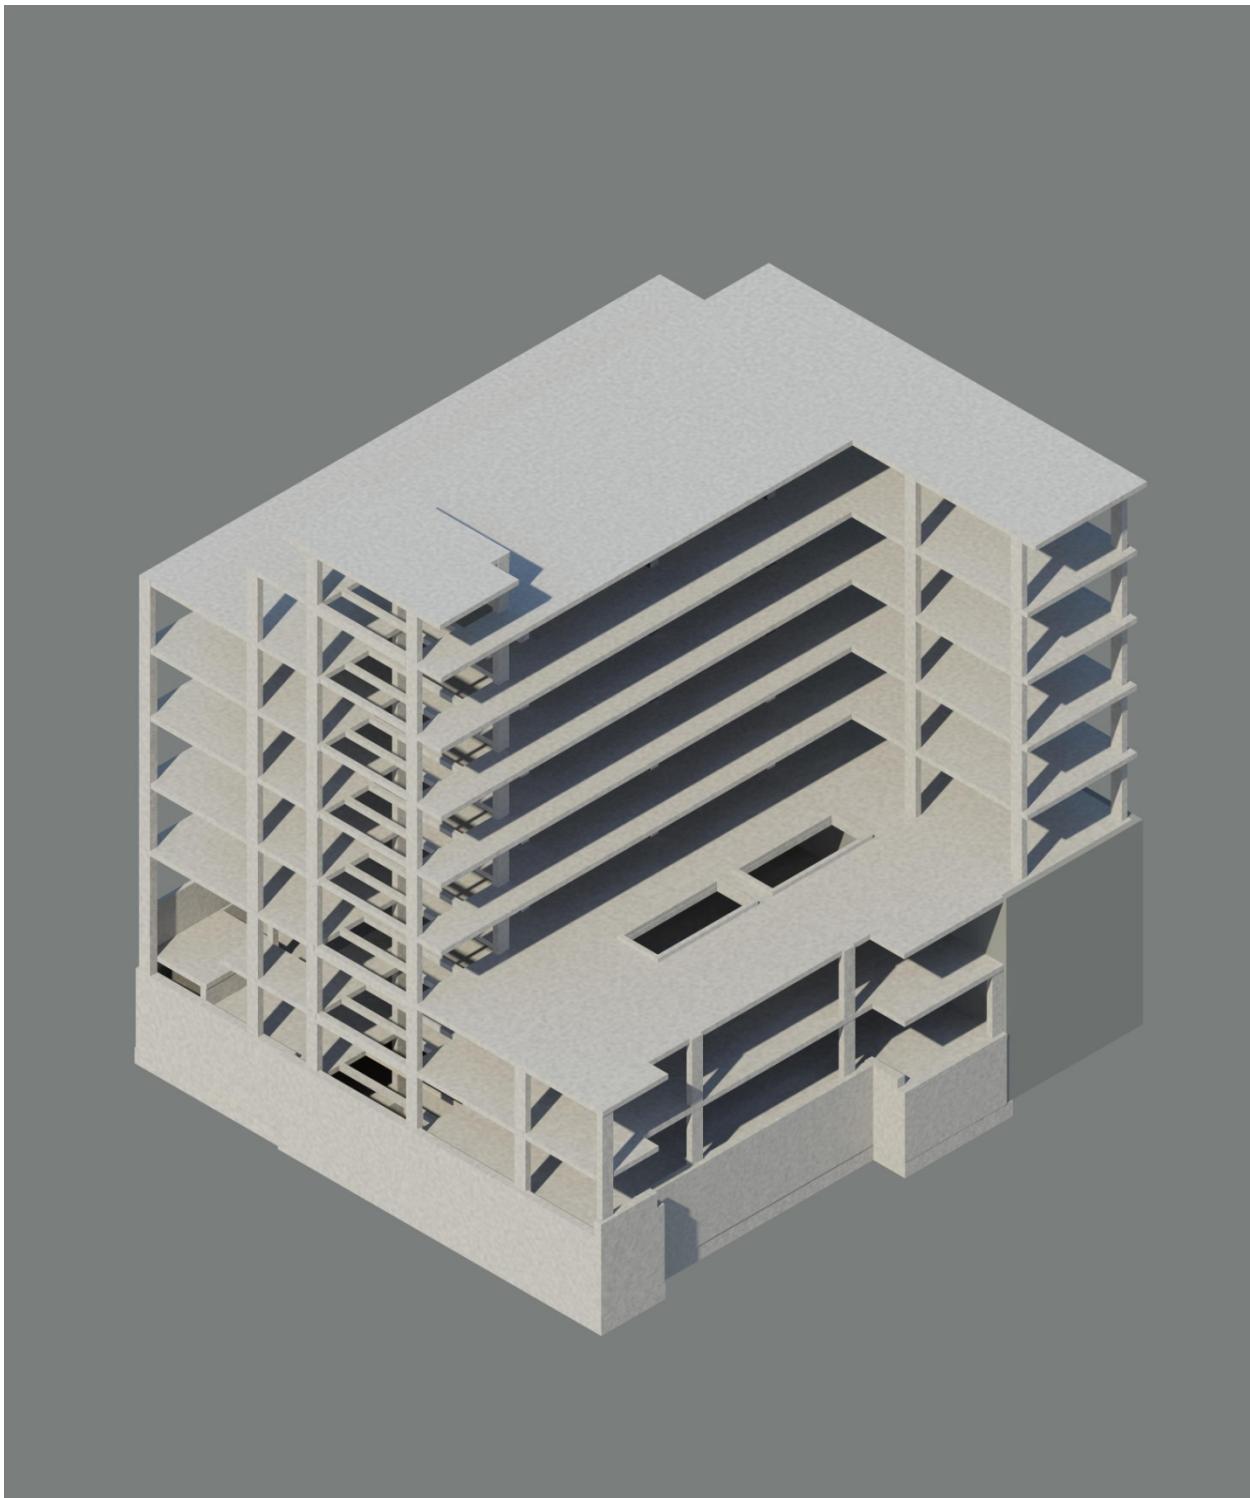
Shows the Three Dimensional Model of the Revit Structures Model
